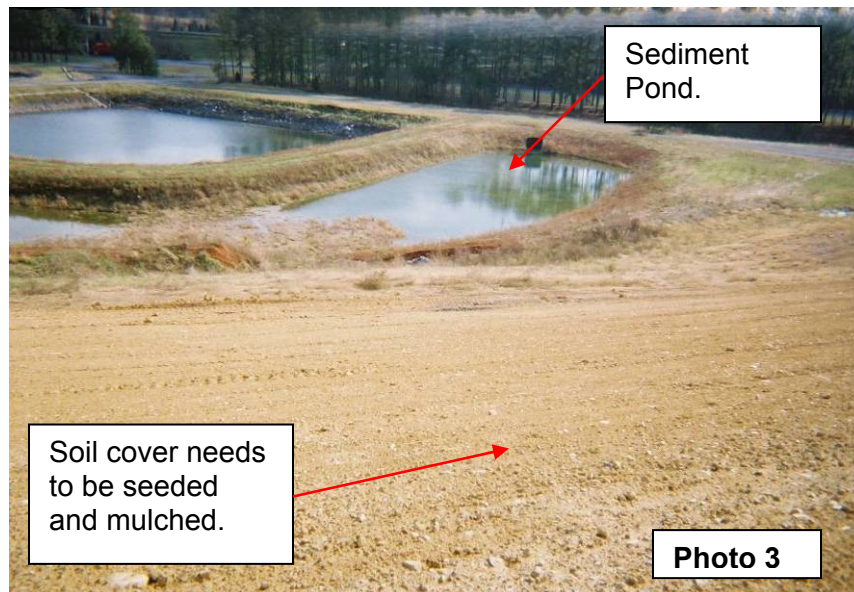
Looking Southeast. Sediment Pond for Dry Ash Stack.
